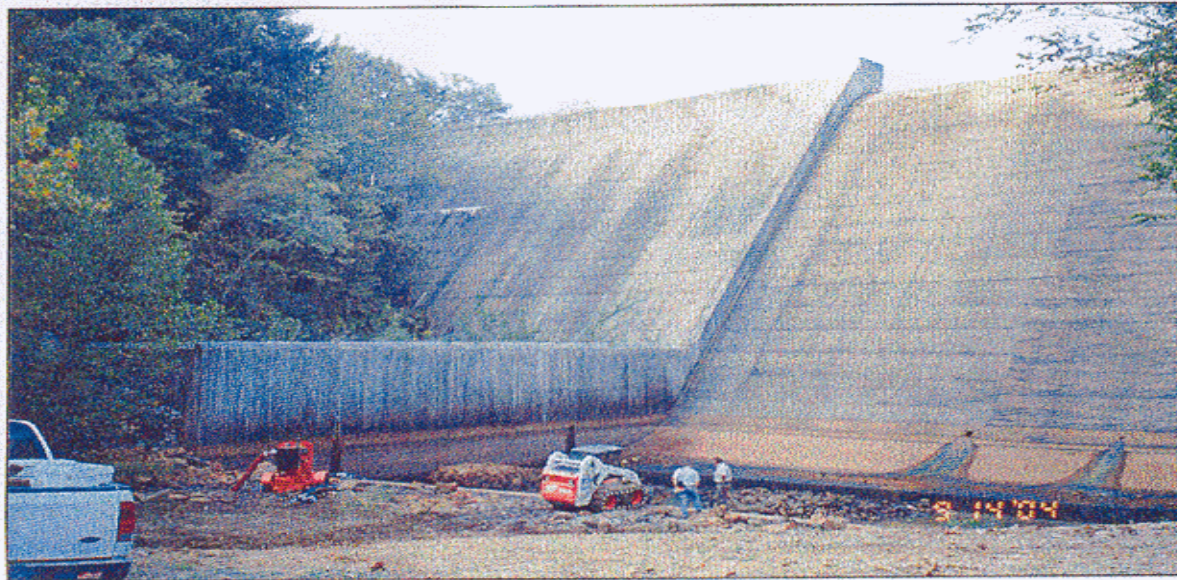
Dewatering, Inspection and Cleanout of Stilling Basin on September 14, 2004.
